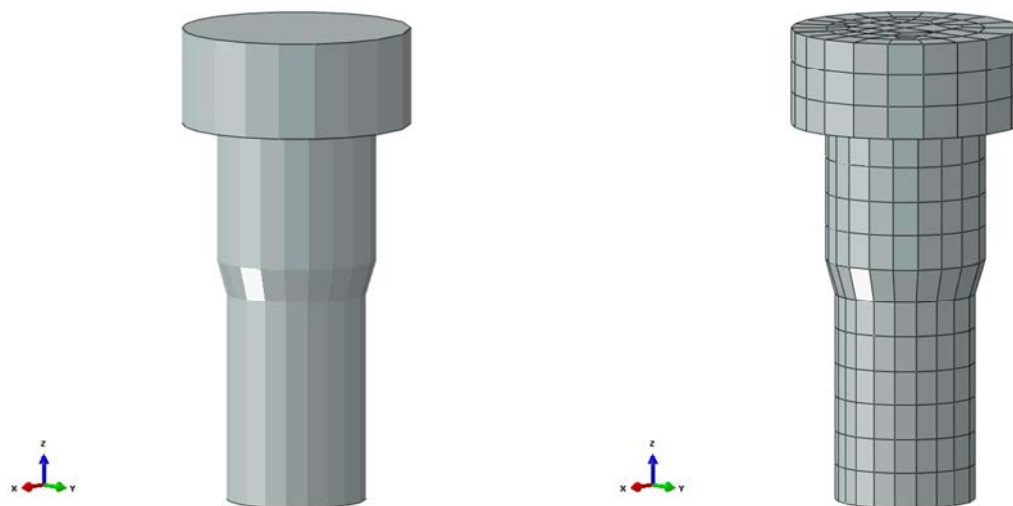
Screw geometry (left) and mesh (right) – used to fix the steel lid to the insert.
